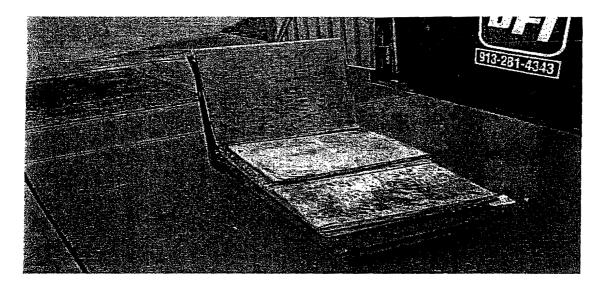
Moldy Construction Debris found in 11<sup>th</sup> Floor Outer Ring, Back of the West wall of 11TS5. This construction debris was found in the same location as the material shown in Photos 31 and 32. Much of the scrap had large quantities of mold.
